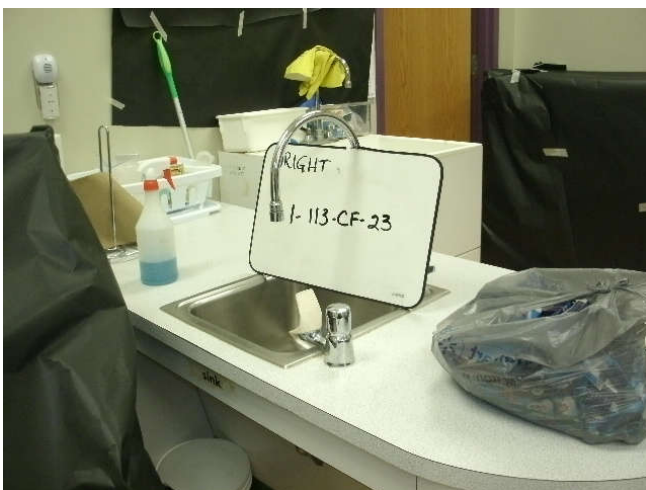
Classroom faucet w/bubbler, located on the 1st floor, in room 113.
